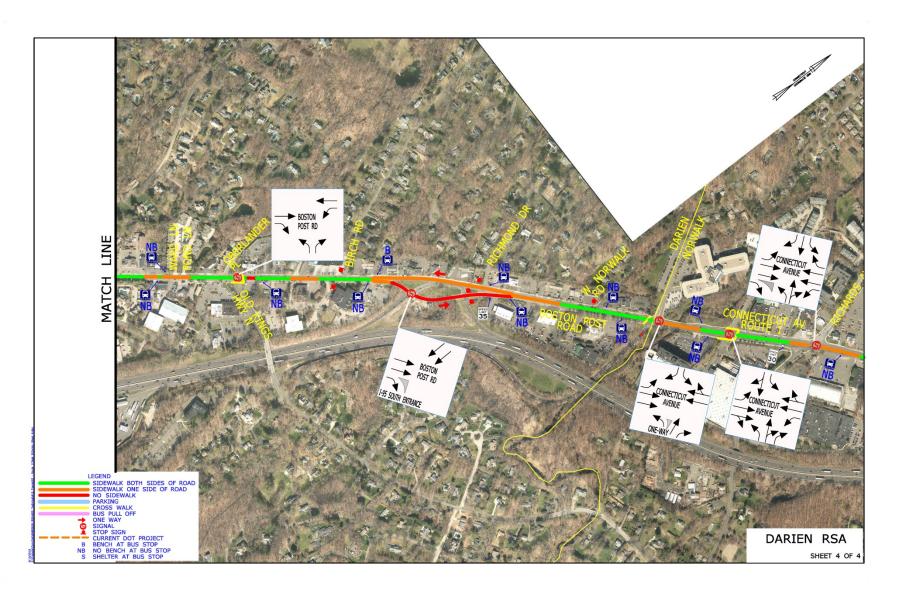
, Post Road, Daren Route 1 - Road Geometrics
